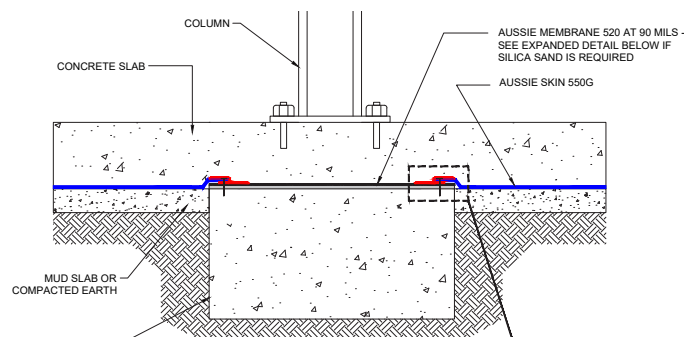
GRADE BEAM HYDROSTATIC
